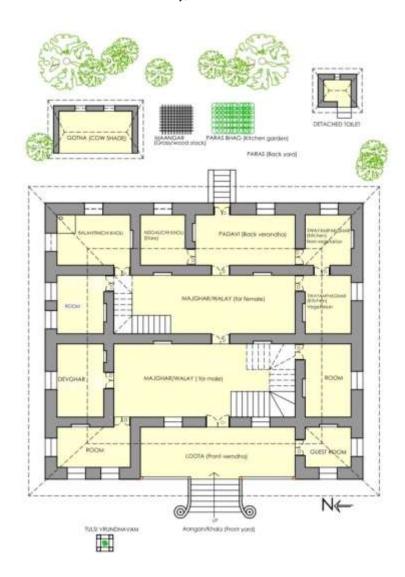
a: Ground floor plan of House influenced by Socio-economic status at Sawantwadi. Source: Author
